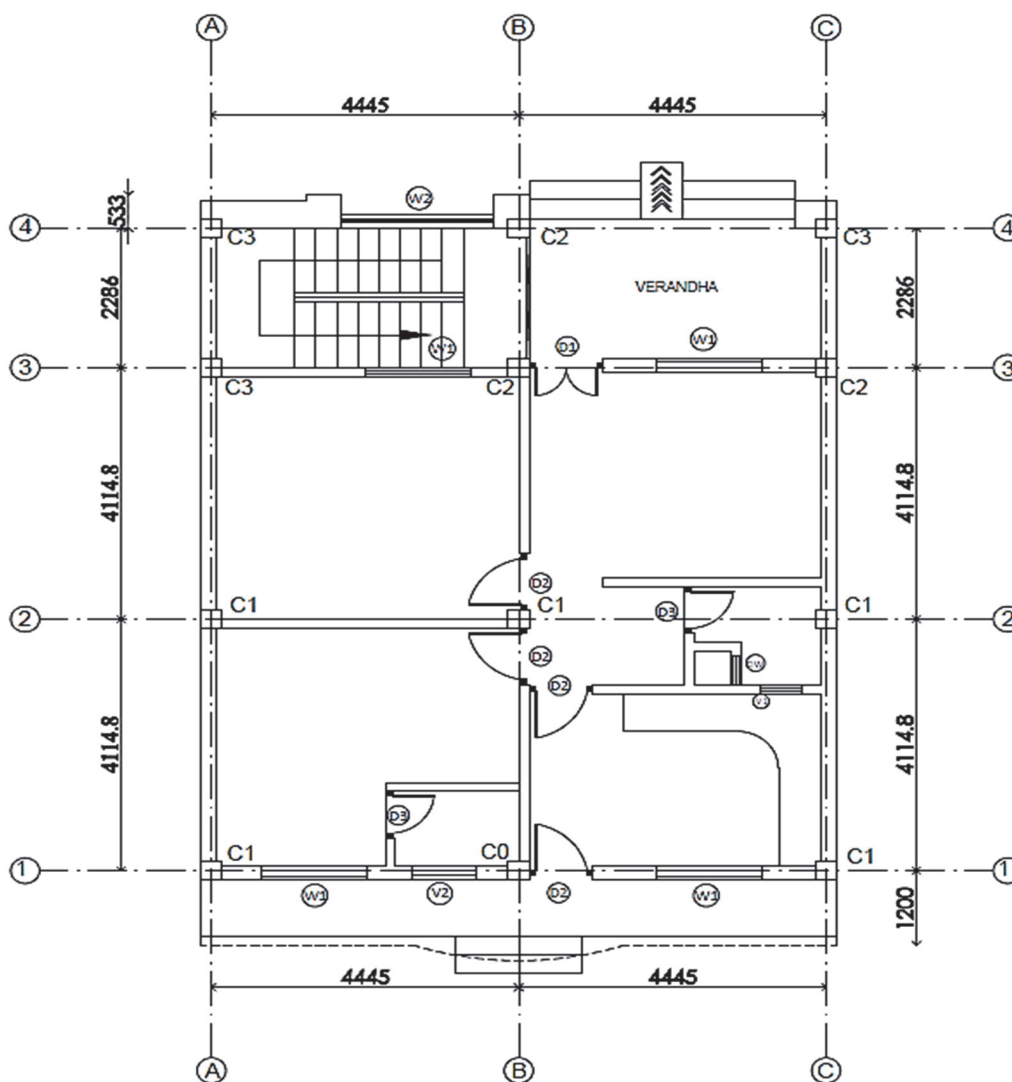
Typical floor plan of study building structure (all dimensions are in mm)
